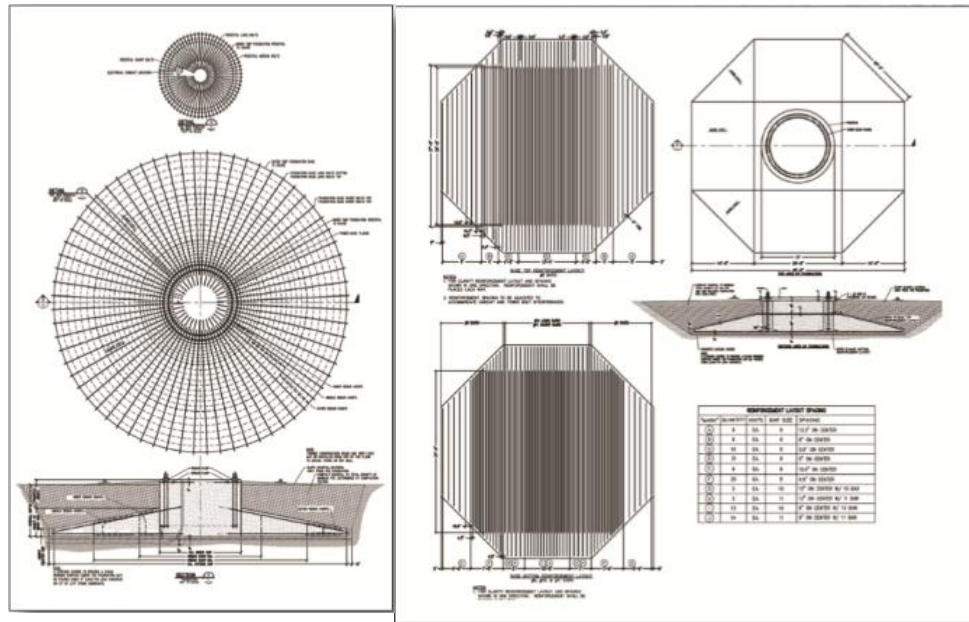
Gravity Spread Footing Design (Terracon Consulting Engineers and Scientists, 2013)
